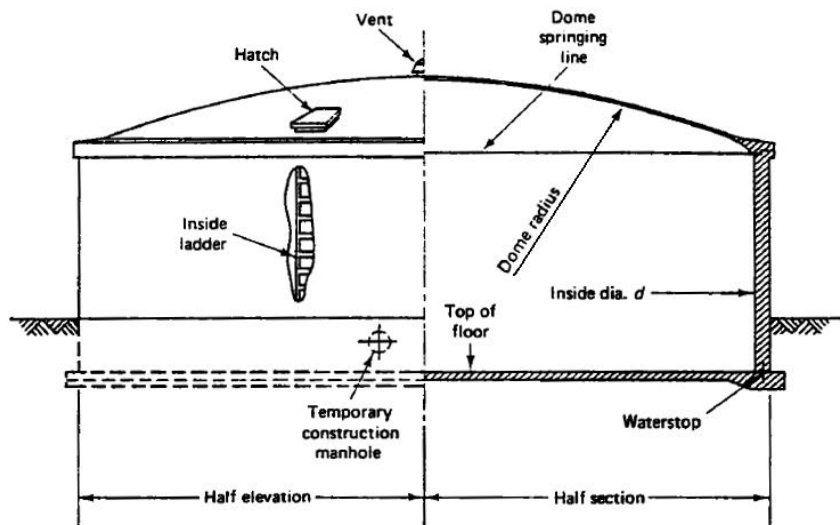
Typical elevation and section of a domed prestressed concrete circular tank.
